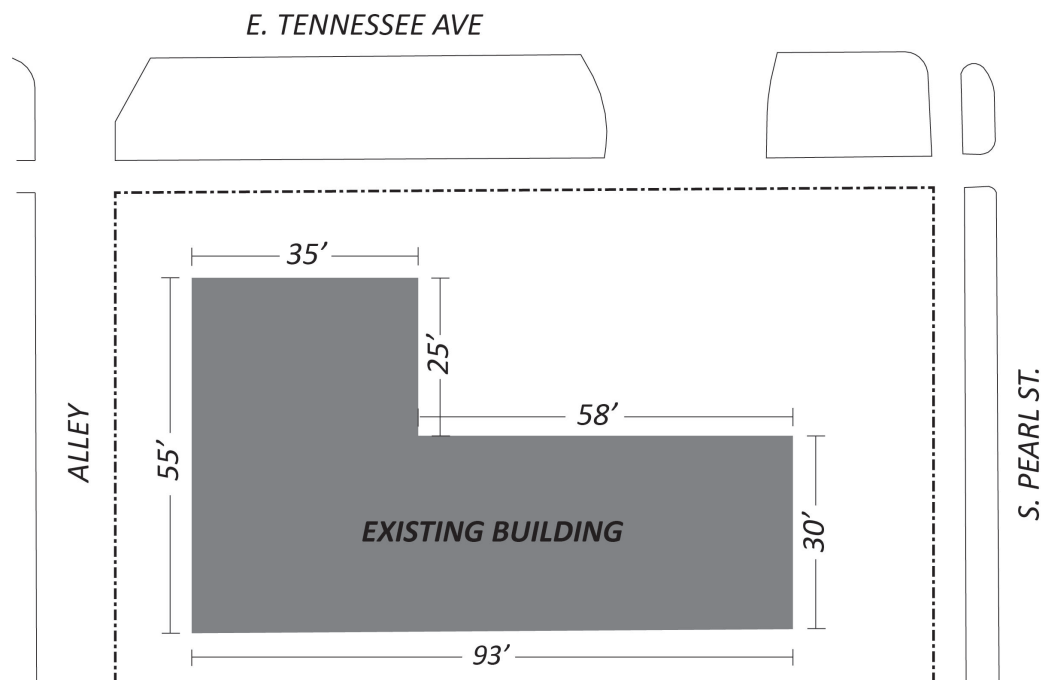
Existing Building Defined within PUD-G 29 (dimensions are approximate)
